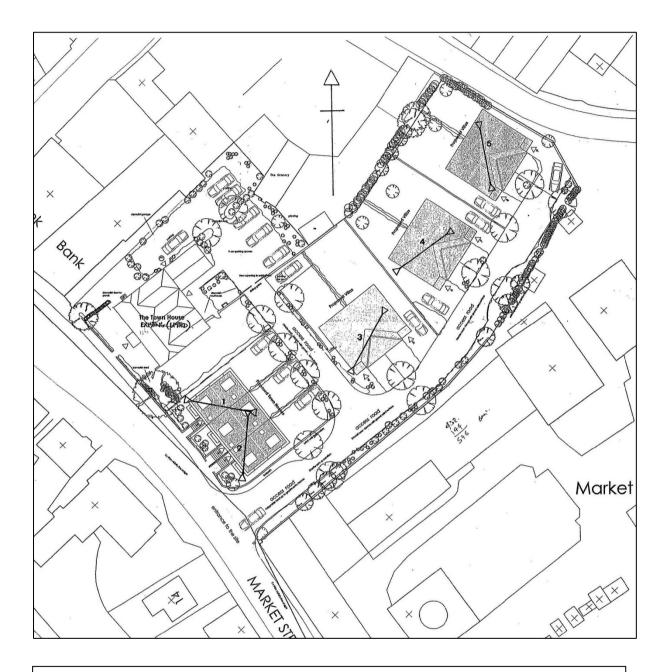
Land at Burtenshaw Lane, Market Street, Hailsham: Plan of site showing evaluation trenches excavated in 2006 (adapted from DAS Report)
